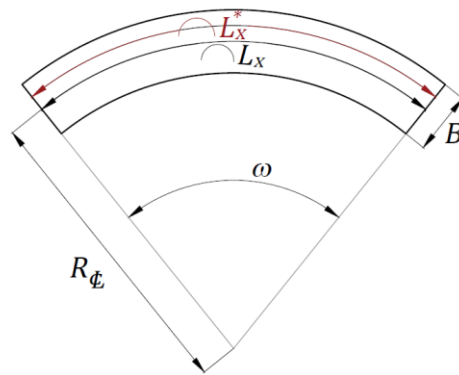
Layout of a Generic Curved Bridge in Plan.
